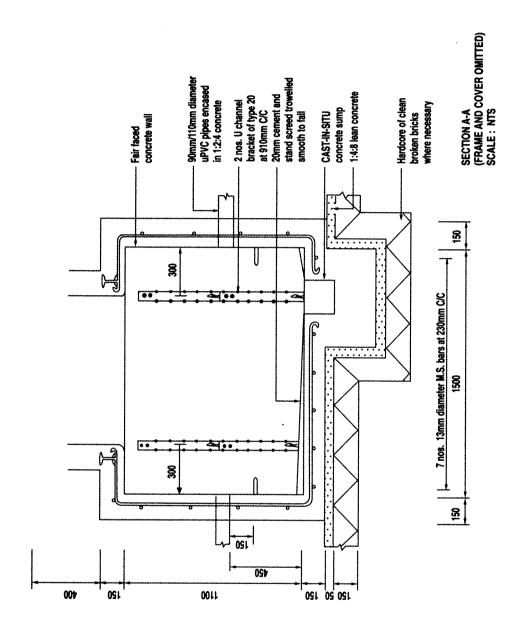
MANHOLE DRAWINGS - TYPE MX1
